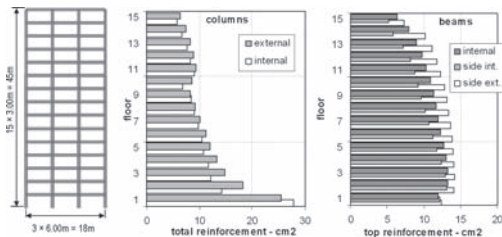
Geometry and reinforcement of the fifteen-storied RC plane frame.
